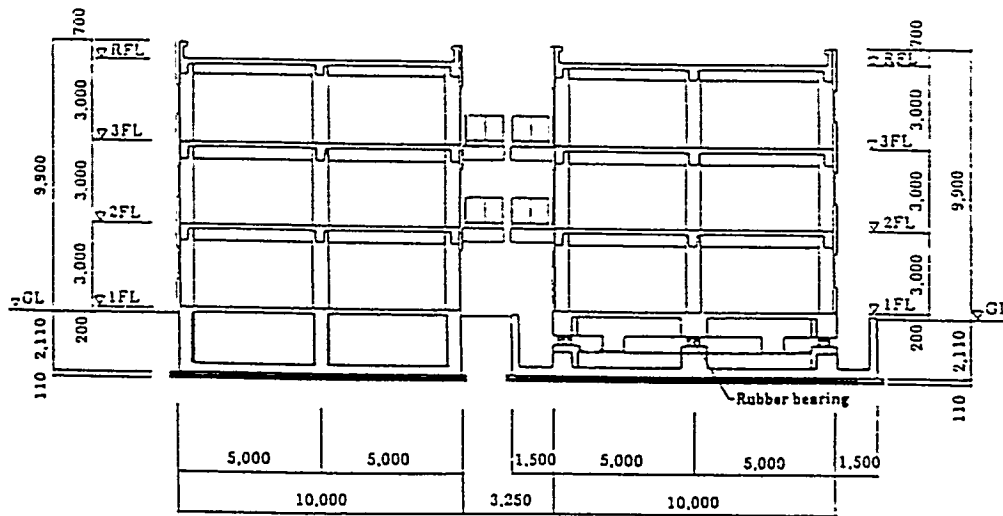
Elevation of Test Buildings (left: ordinary building, right: isolated building)
